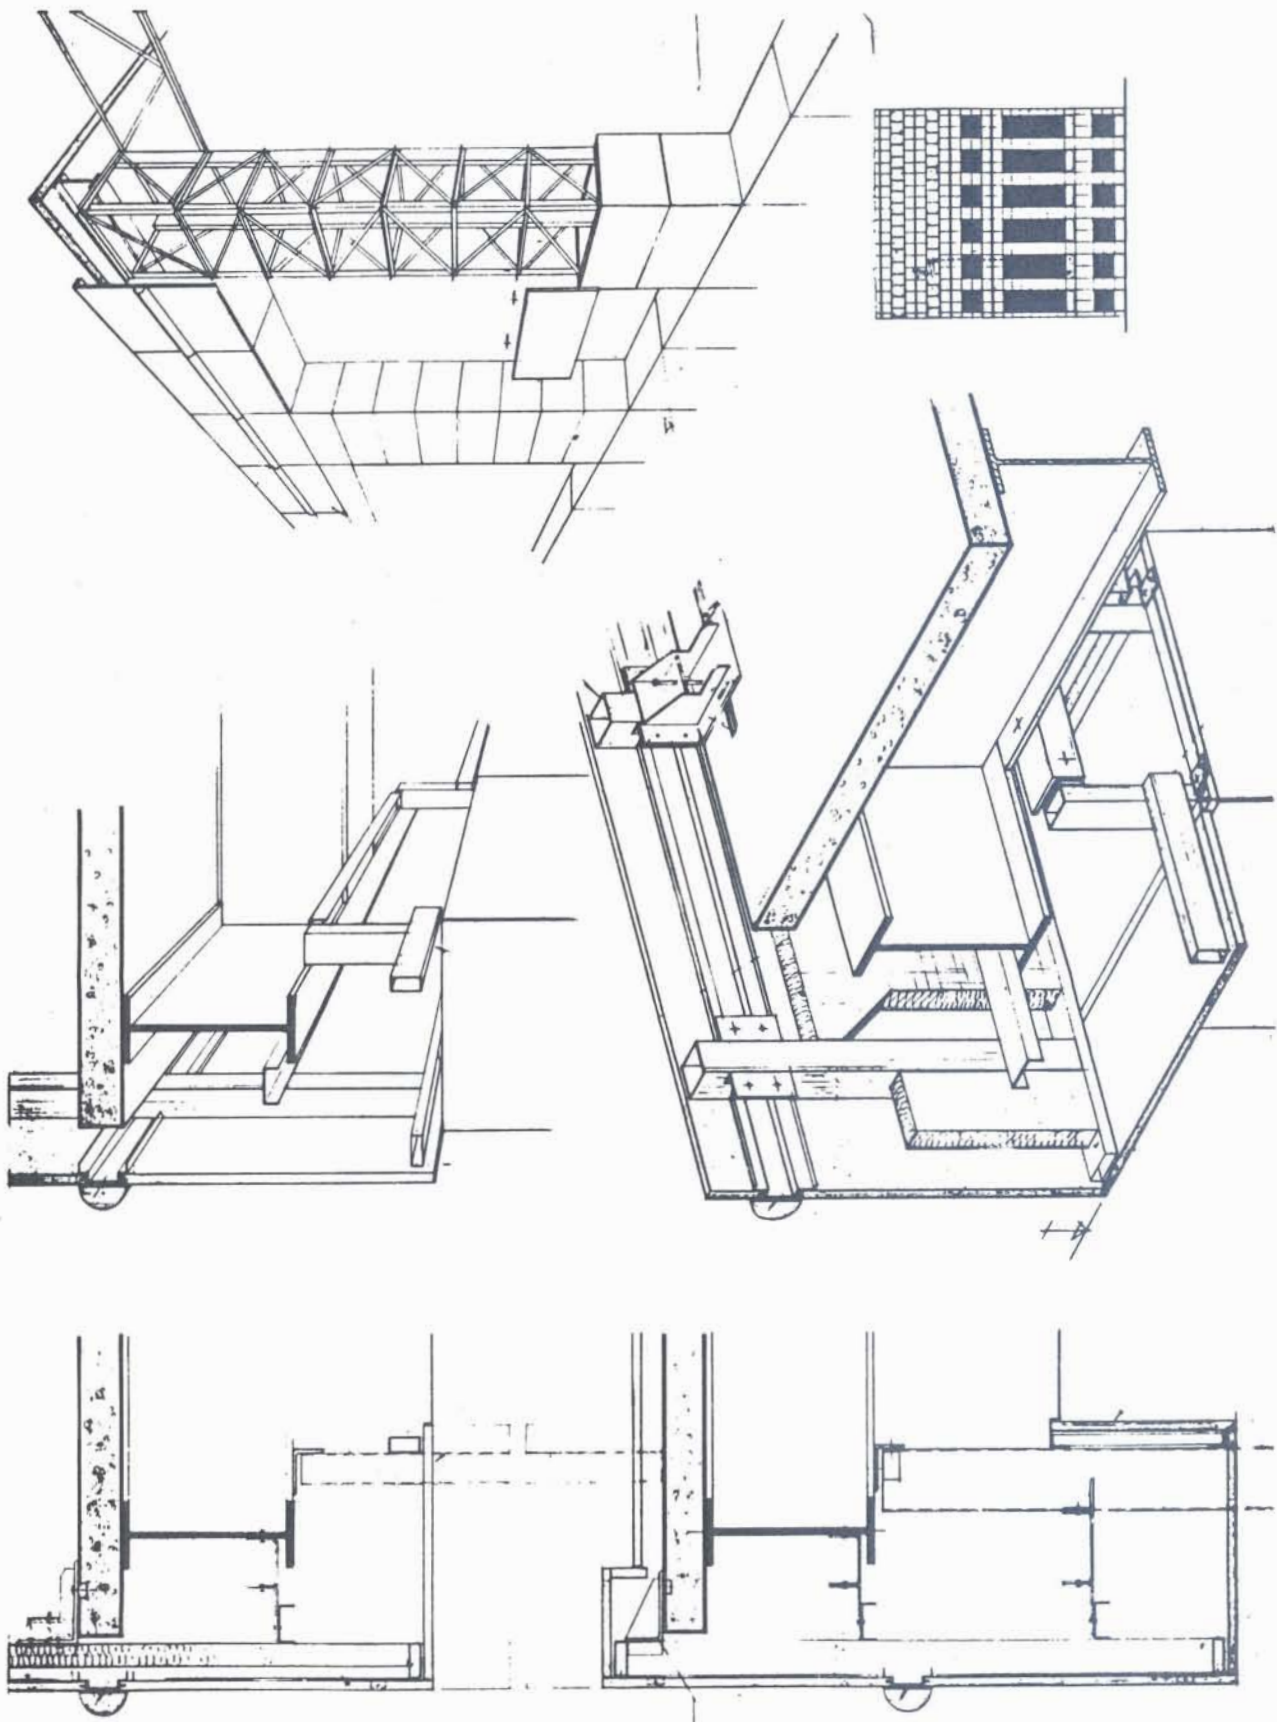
San Benigno North Tower. Detail of the fixing devices and of the steel frames.
